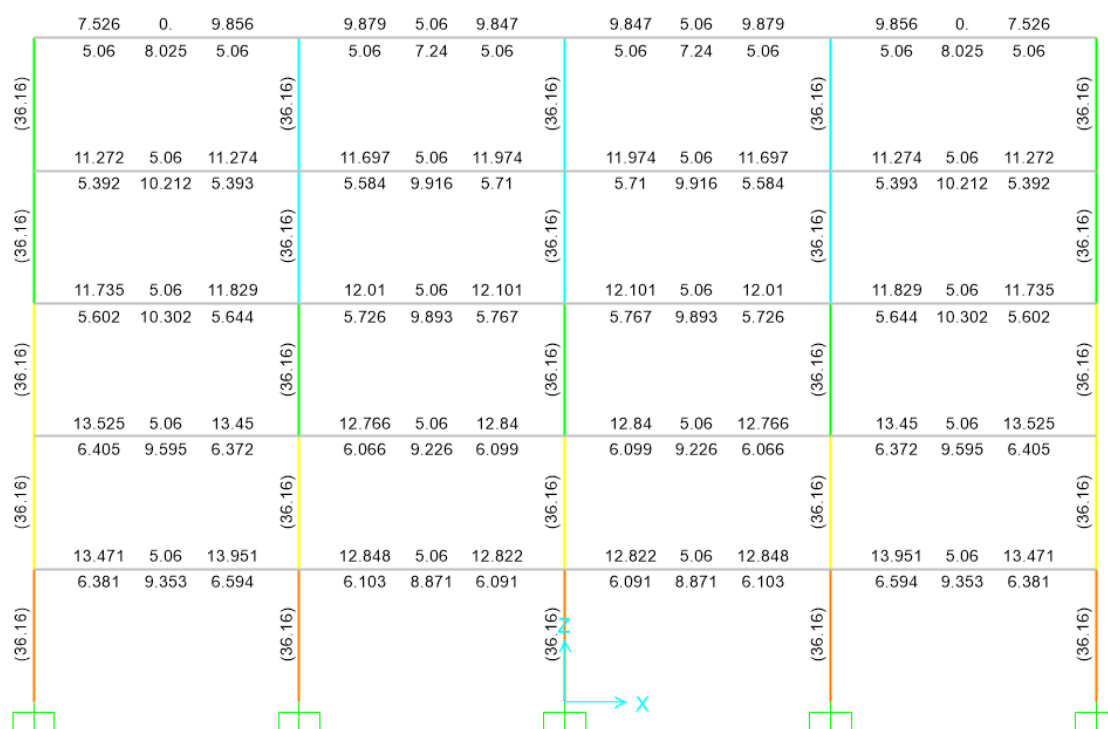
Check of demand/capacity ratio for columns in the central longitudinal frame, required amount of rebars in beams (in cm^2).
